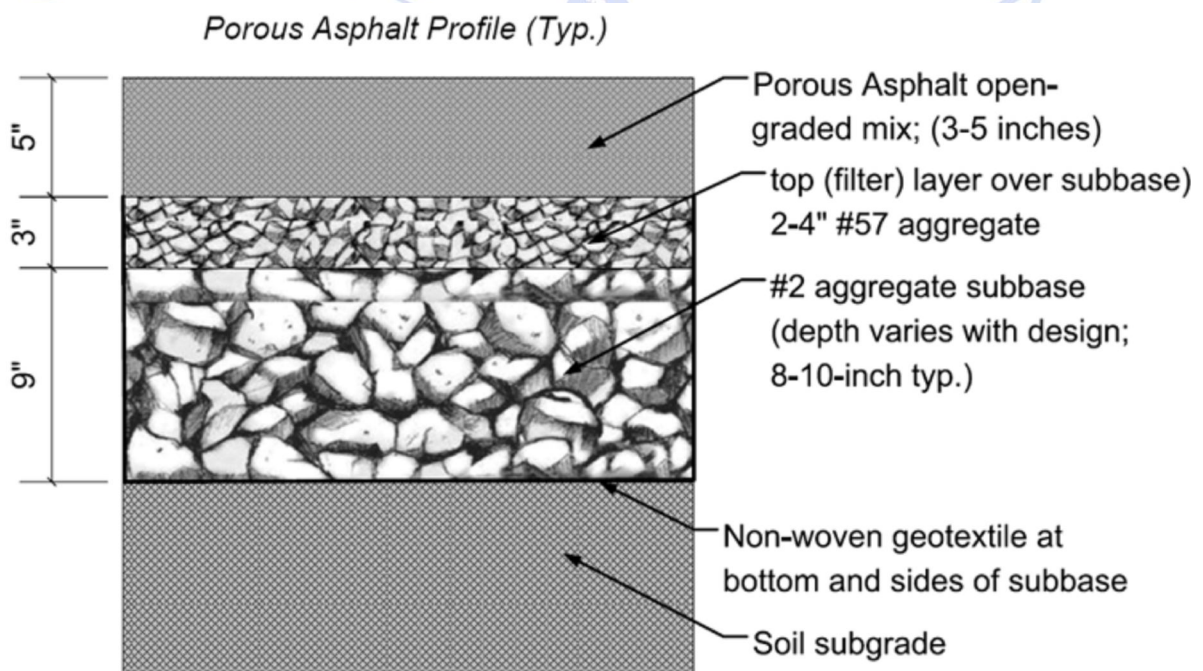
Typical cross-section for porous asphalt pavement (Iowa Stormwater Management Manual , 2009).
